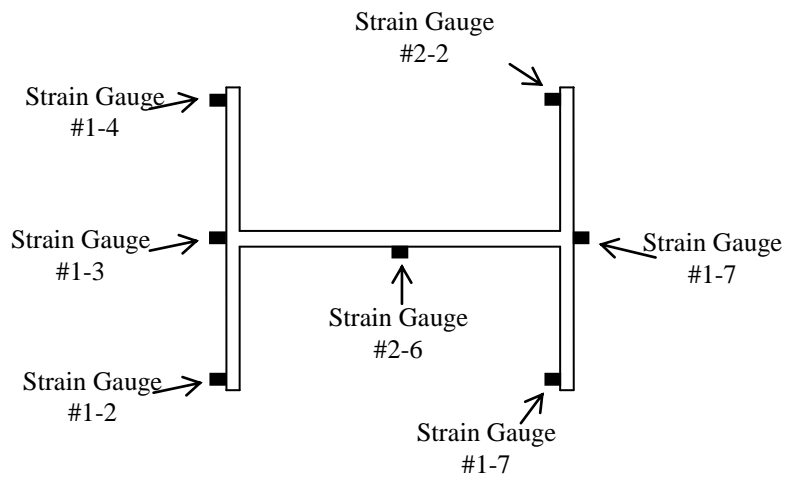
Strain gauge arrangement at upper level of the 400 mm-high steel base fixture.
